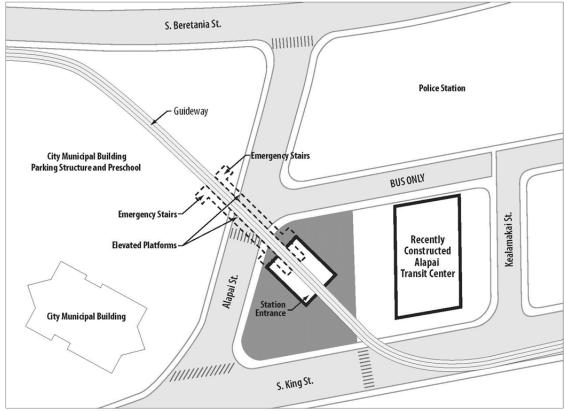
Beretania Street Tunnel Alternative Alapai Street Station
